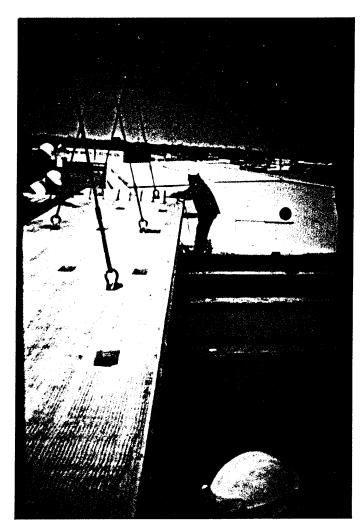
The Next to the Last Panel Being Positioned on the Bridge.
